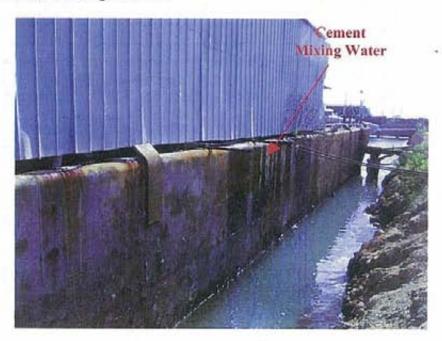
Evidence of runoff from the cement mixing on-board the work barge.
